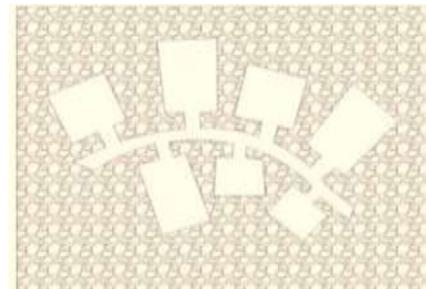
Schematic plan of the location of rooms in Nosh Abad
